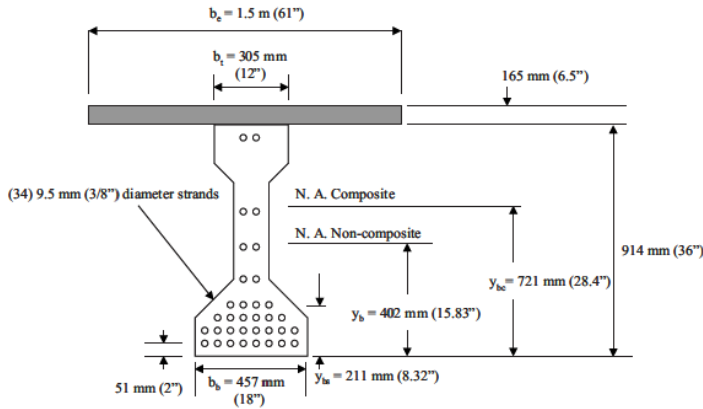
Cross-section of a girder of a prestressed bridge (Lebeau and Wadia-Fascetti, 2010)
